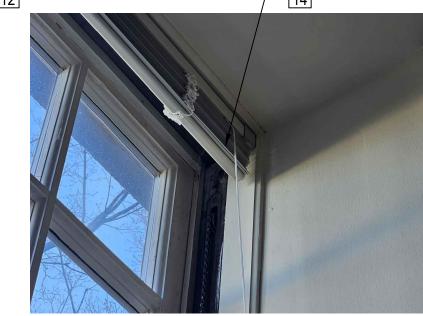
VIEW OF EXISTING BLINDS INSTALLED ONTO EXISTING INTERIOR
